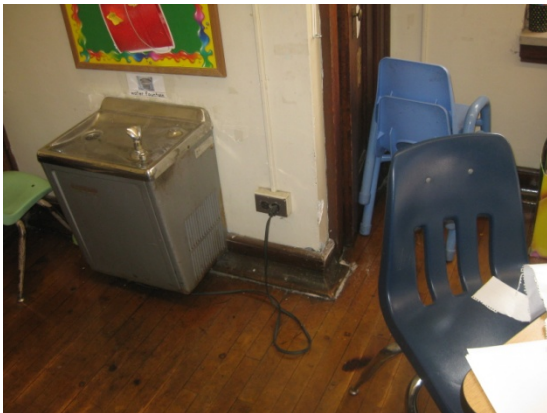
Outlet next to a water fountain should be a GFCI outlet - Crossan
